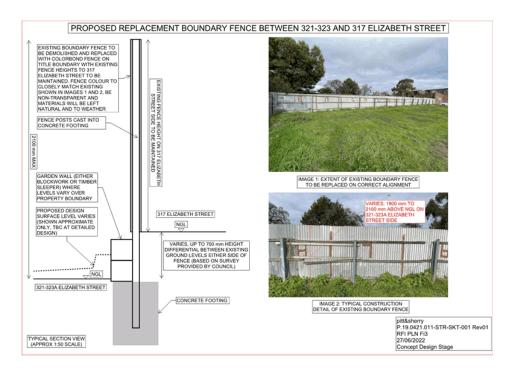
existing and proposed boundary between 317 and 321-323A Elizabeth Street
